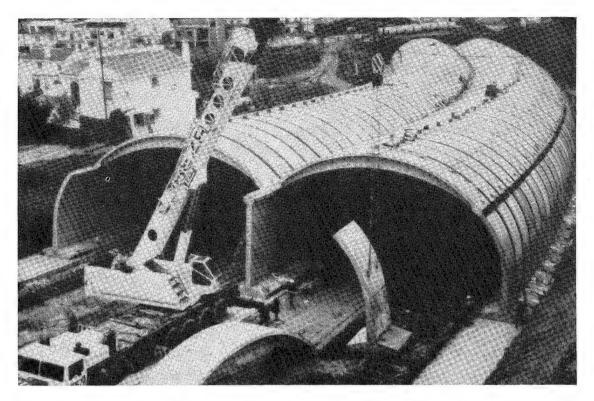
Double arch tunnel system to be used in St. Hubert Tunnel (from ASCE 1992)
